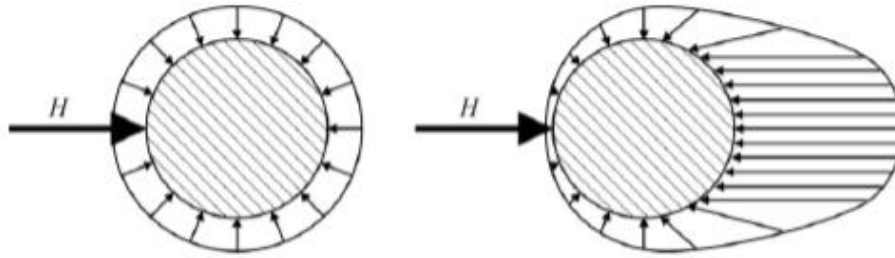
Soil stresses surrounding a pile before- and after application of horizontal load (Janoyan & Whelan, 2004)
